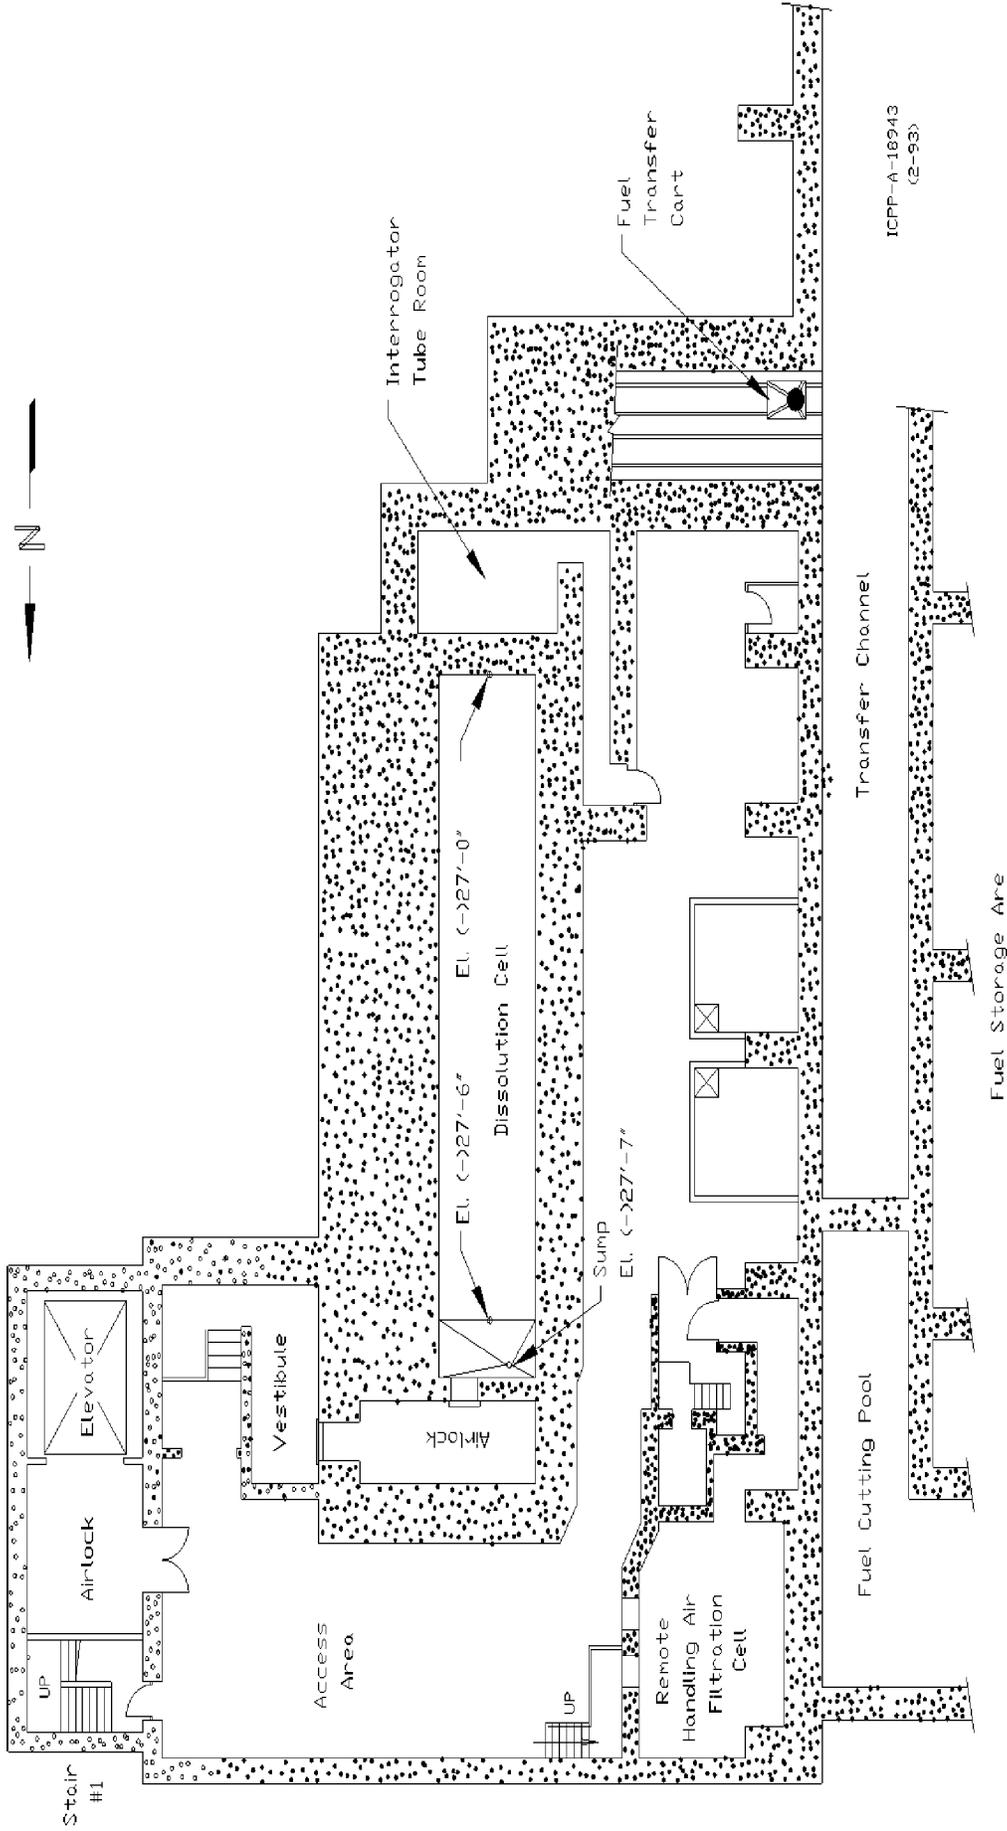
FDP cell floor (-27' 0" elevation).
